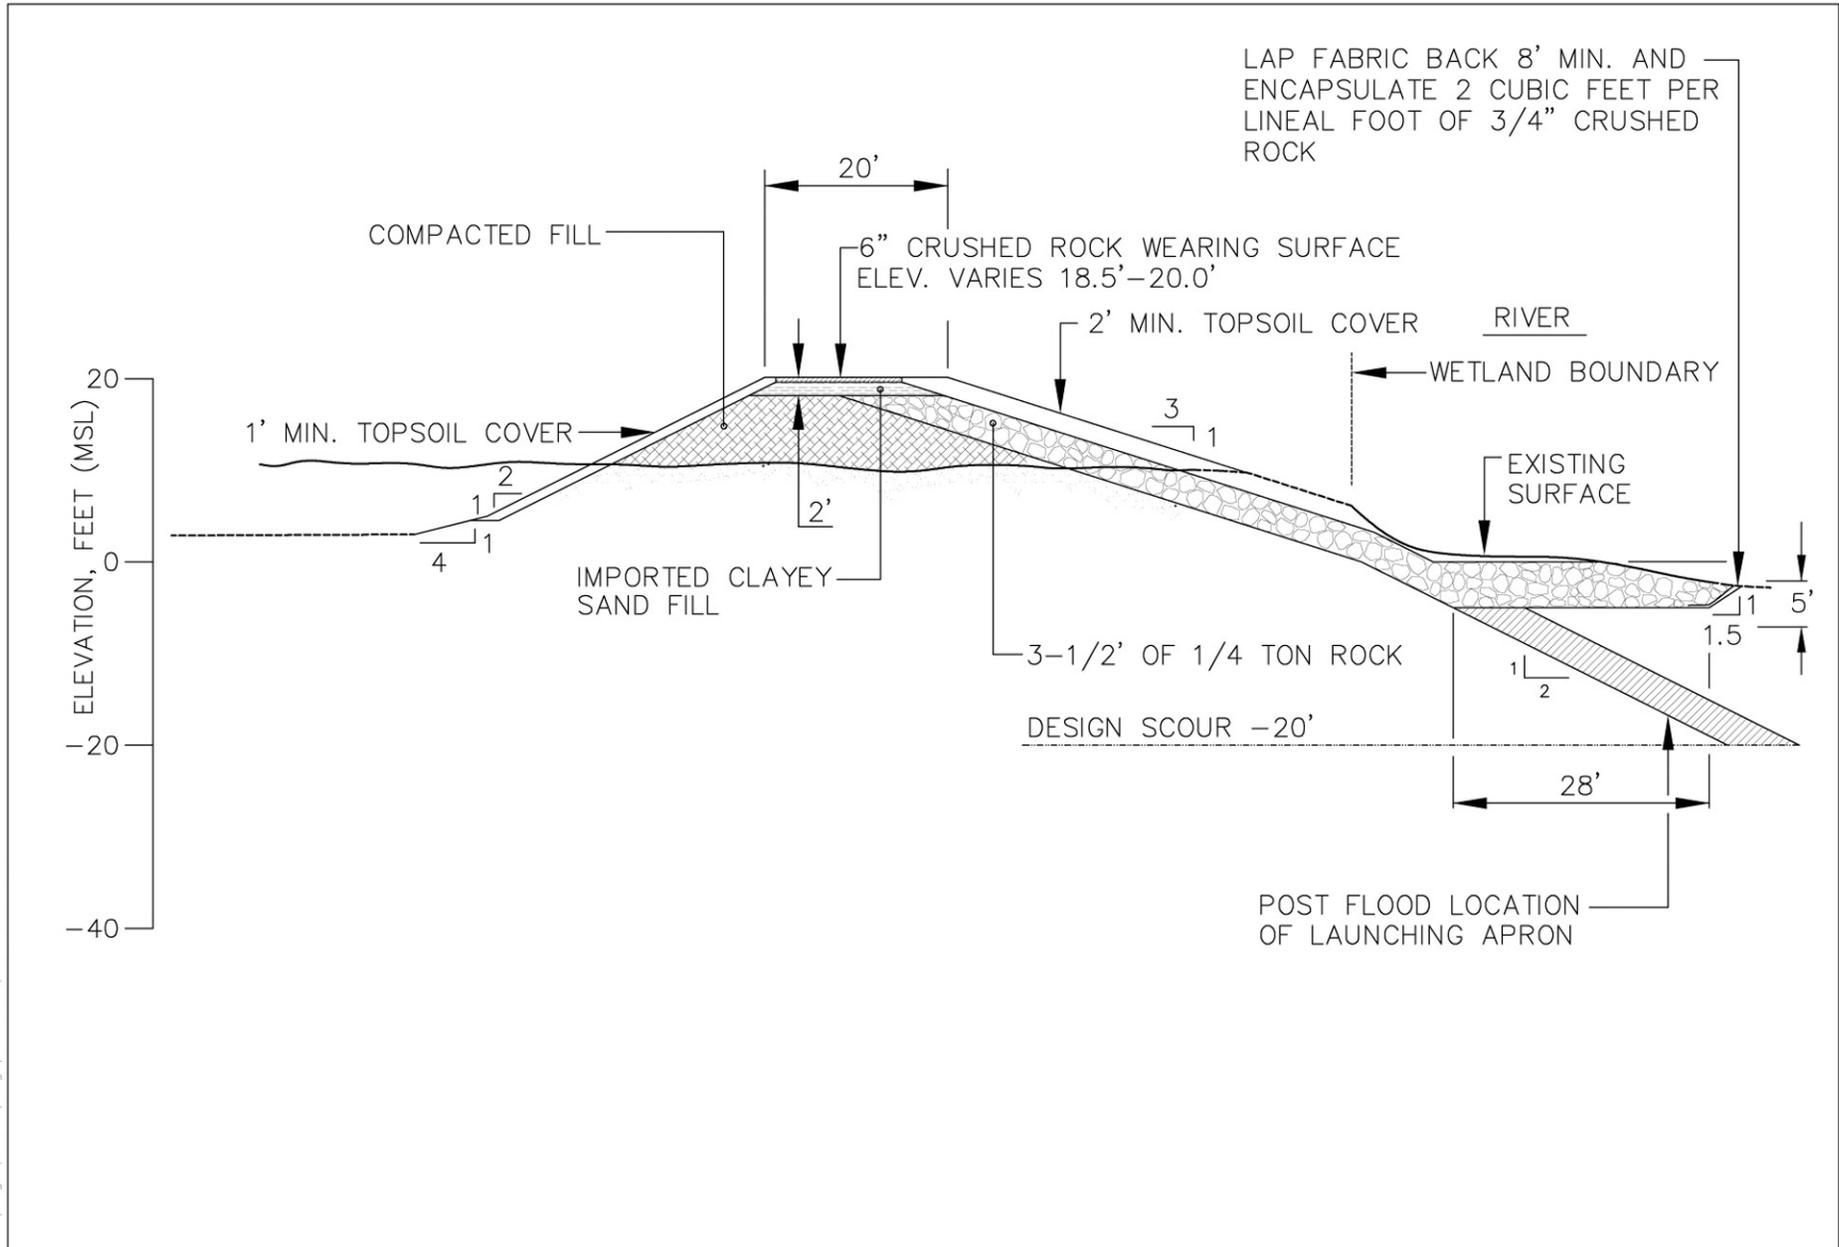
Typical Section of Slope Protection Stone Revetment No. 2
